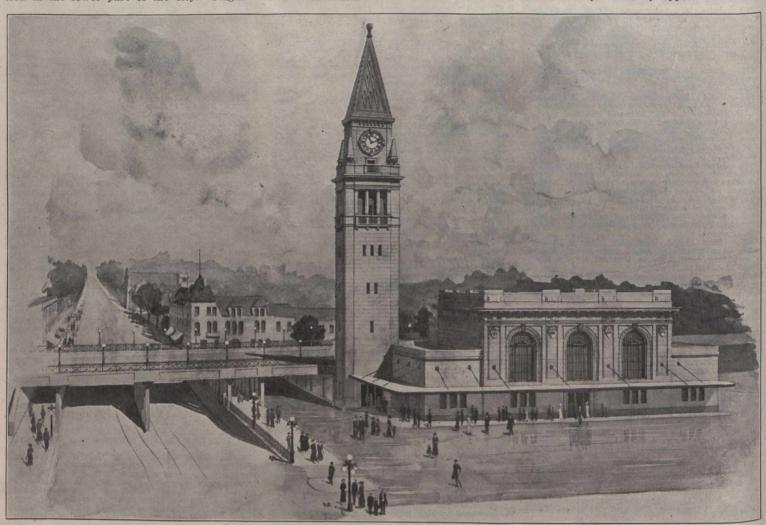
New North Toronto Station for Joint Use of Canadian Pacific and Canadian Northern Railways.
